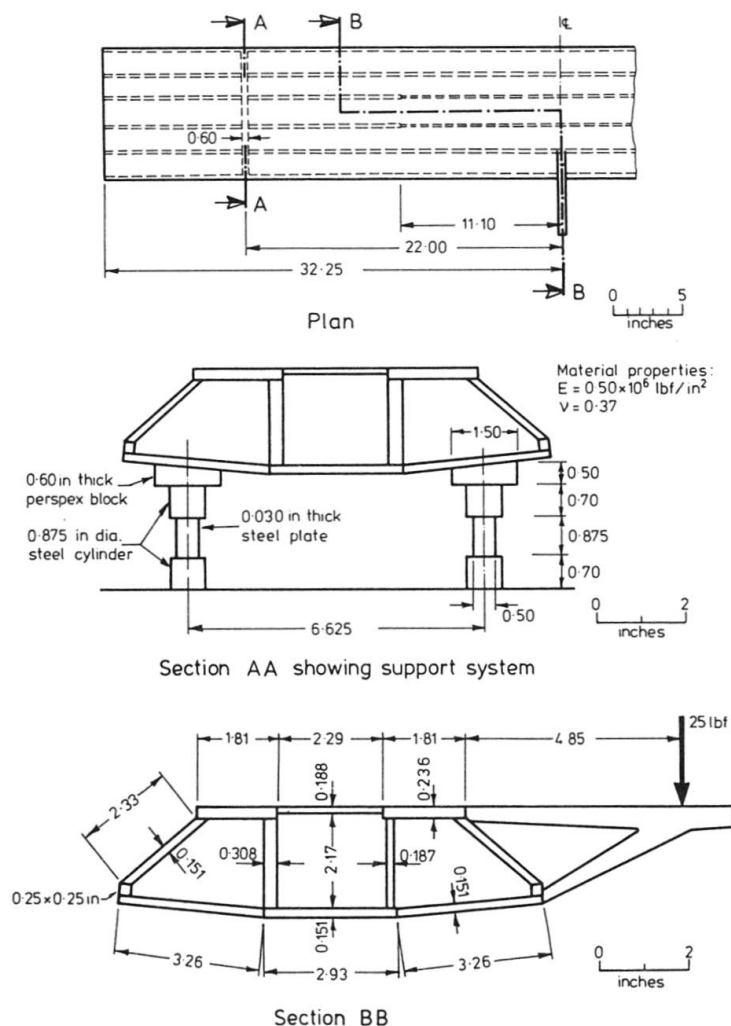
Straight three cell box girder bridge model. Details of model and loading
